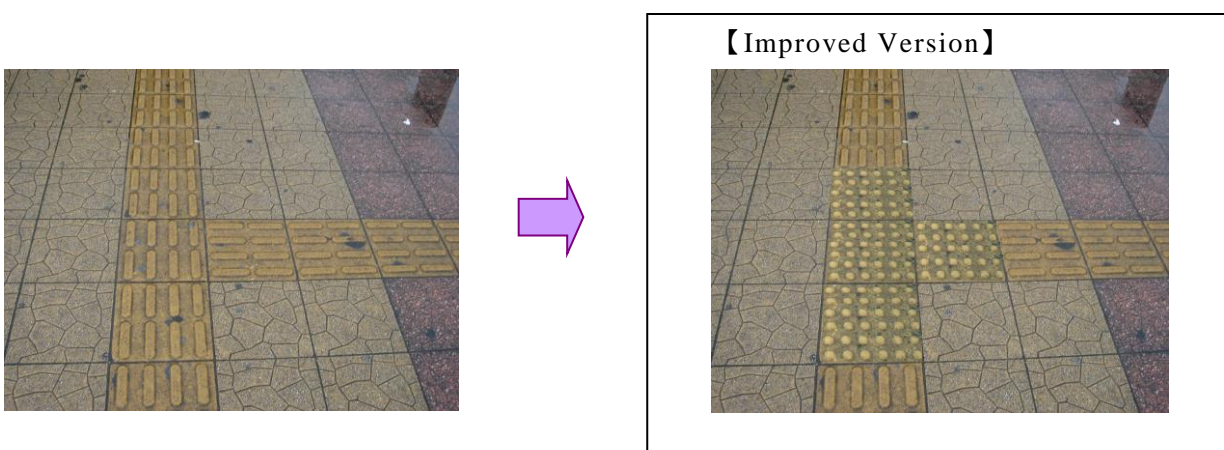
Warning blocks are sometimes not installed at T-shaped intersections, but should be installed as in the improved version. (Chiba, Japan)
